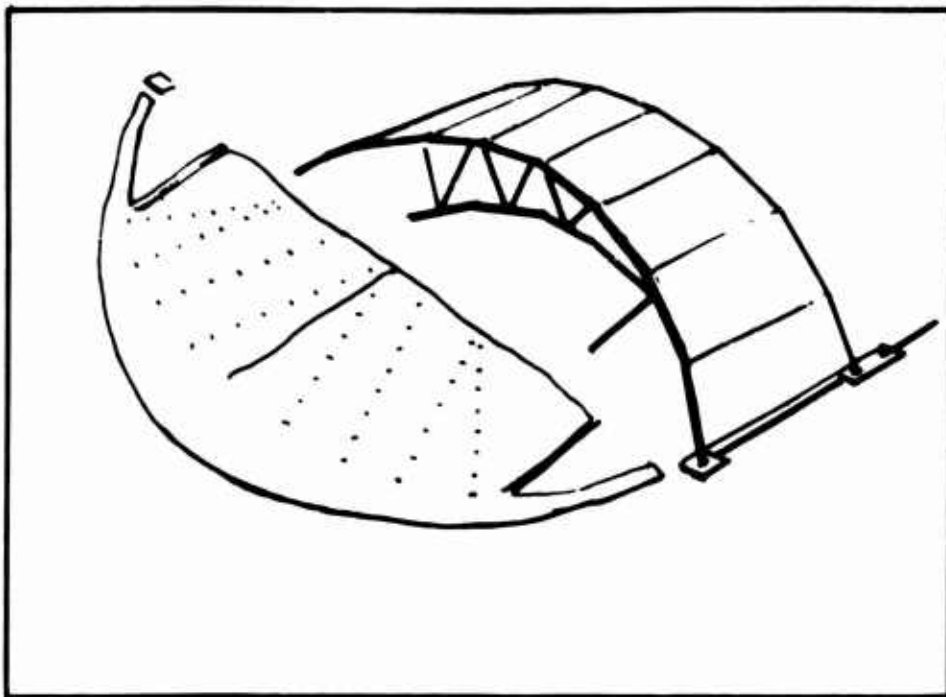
Openable Fabric End Wall Layout Prior to Erection
